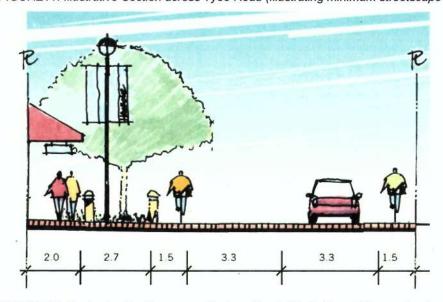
Illustrative Section across Harbour Road (Illustrating minimum streetscape widths)
